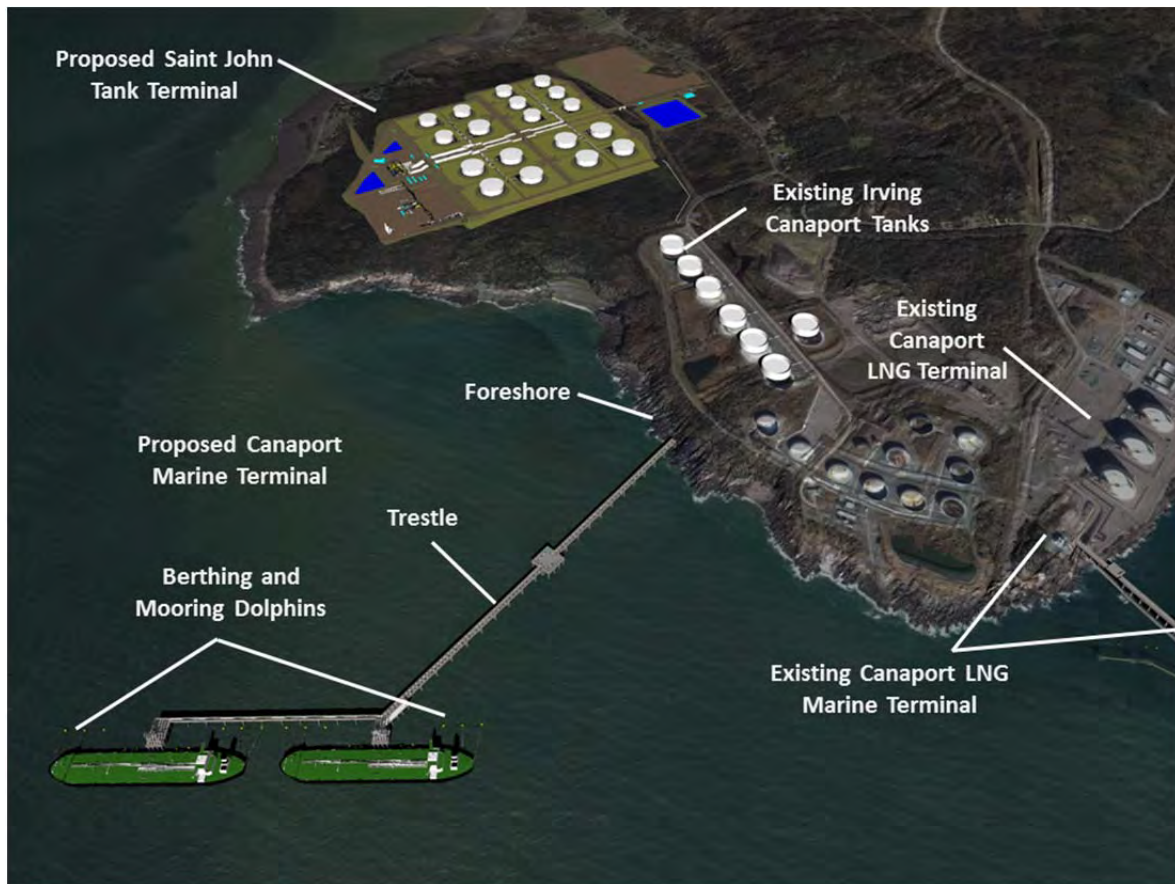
Conceptual Layout of the Saint John Marine Terminal
